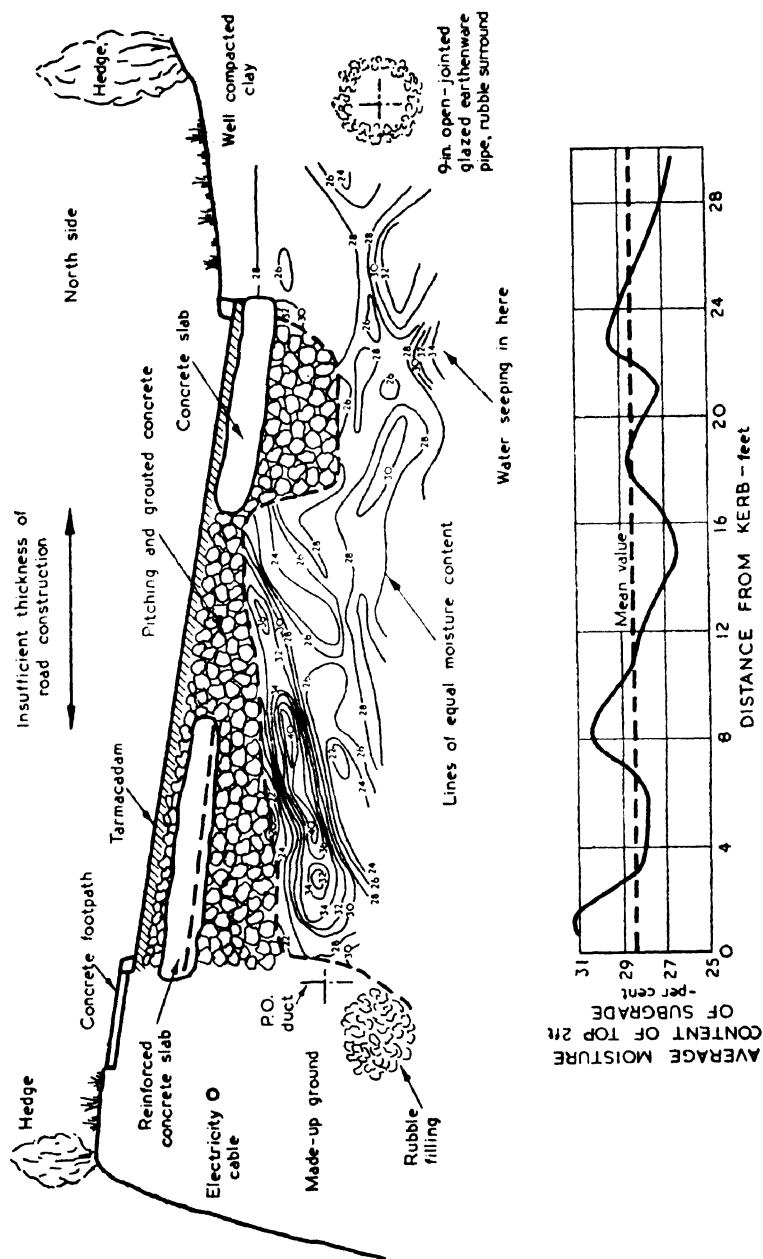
CROSS-SECTION OF BITUMINOUS-SURFACED ROAD AT SITE INVESTIGATED
